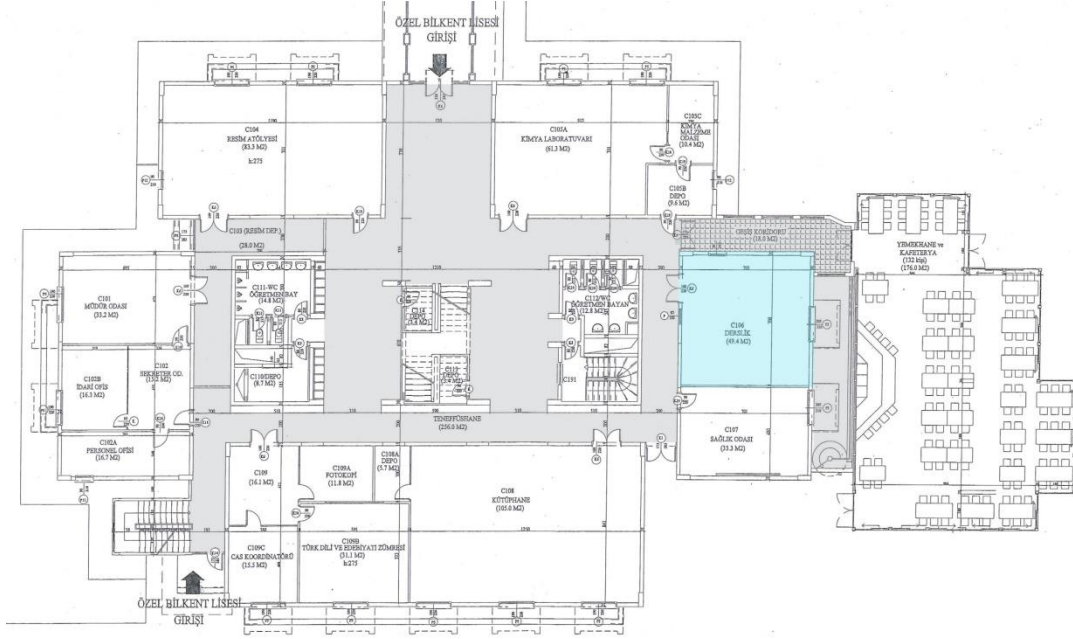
Classroom location in the ground floor plan (not to scale; blue indicating classroom; gray indicating corridors)
